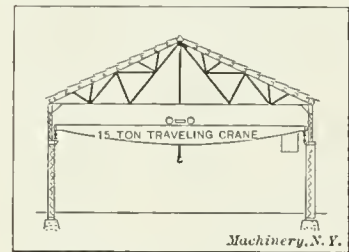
End Elevation, Machinery Demonstrating Building, Joseph T. Ryerson & Son, Chicago
